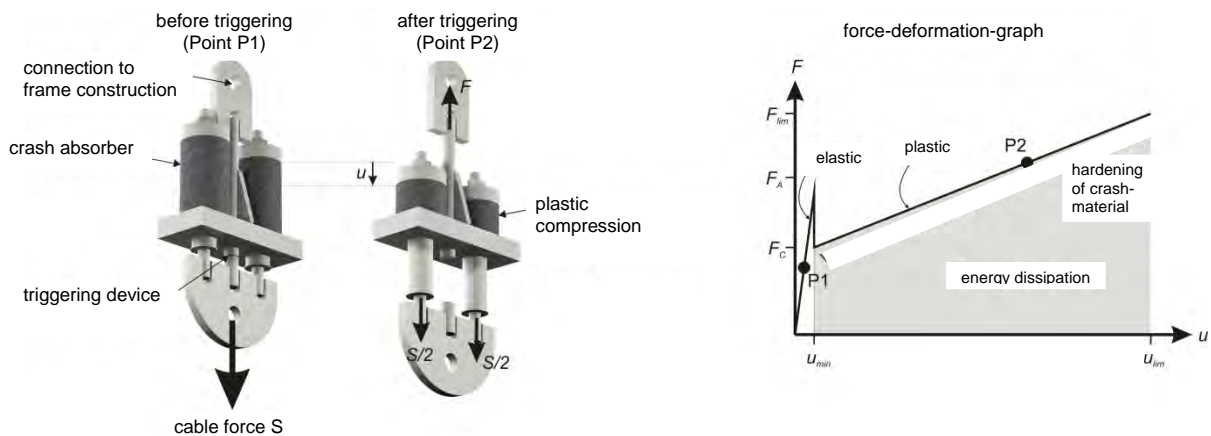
Patented cable-end-connector before and after fuse breakage [12]
